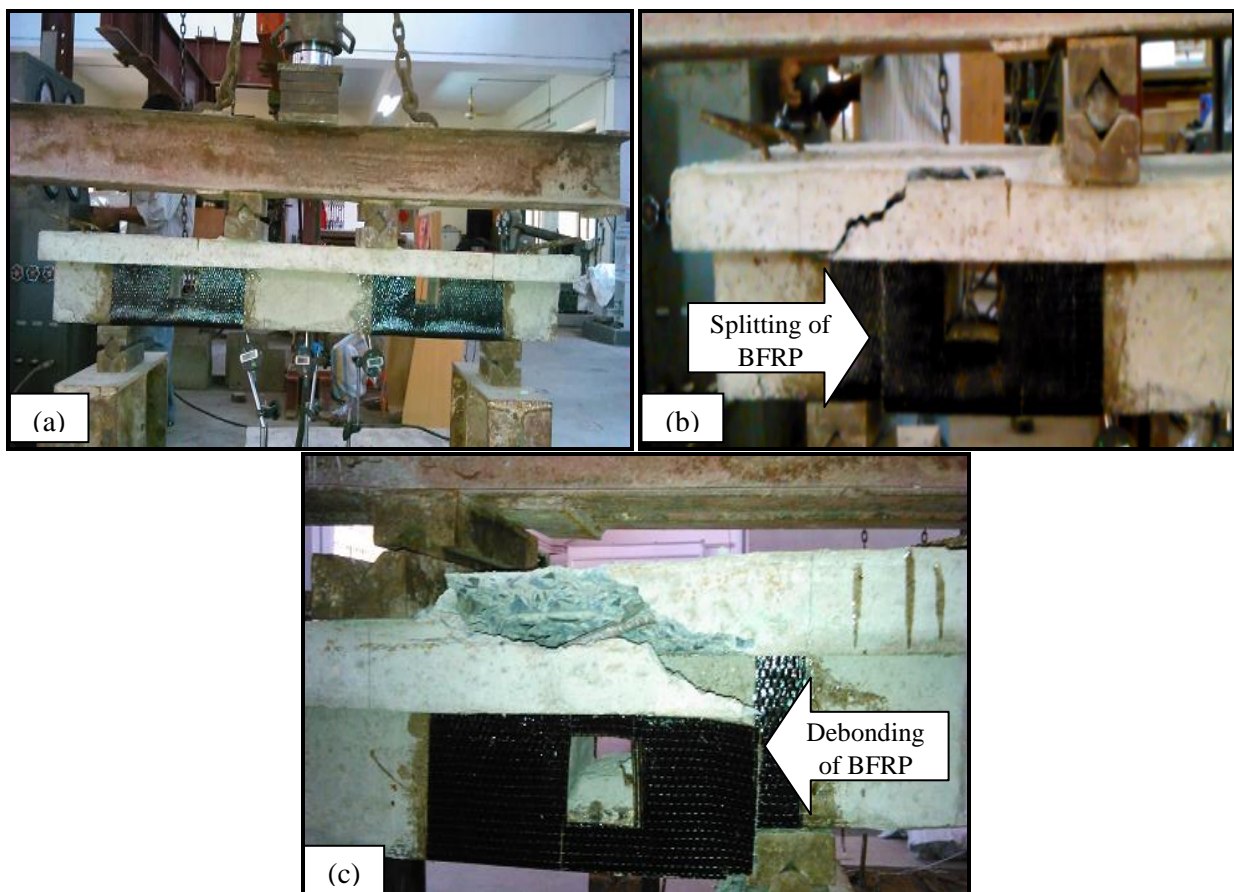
(a) Experimental Setup of beam SB17 under four-point loading system, (b) Initiation of splitting of BFRP sheet, (c) Ultimate failure of beam SB17 by debonding of BFRP sheet followed by diagonal shear crack
